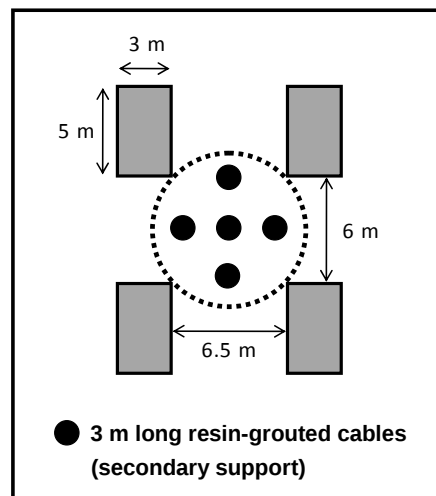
Proposed secondary support pattern for room and pillar stope intersections (plan view)
